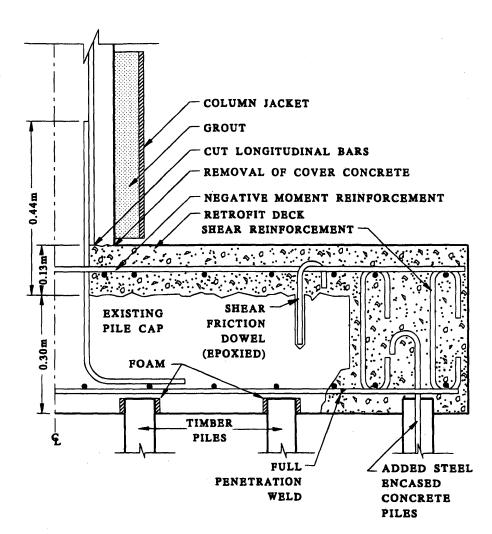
Retrofit scheme for Specimen No. 5 (1 m = 3.3 ft).
